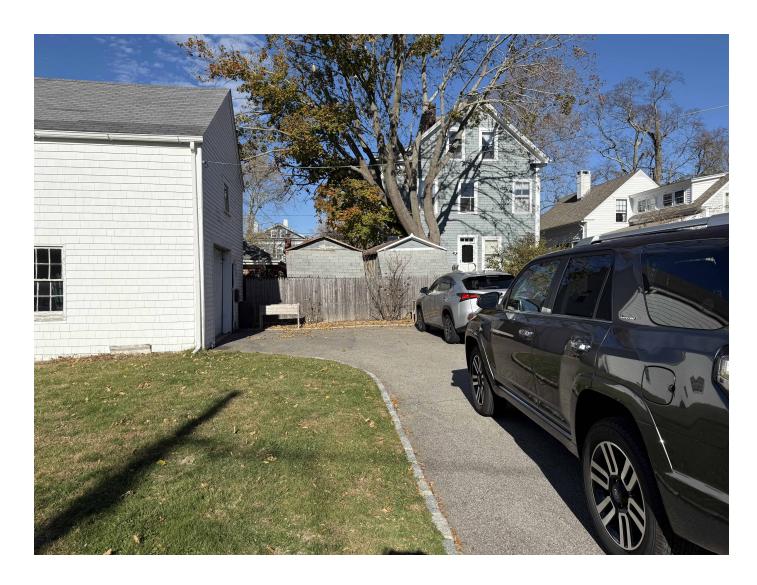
View of north side of property, with existing carriage house & abutting neighbor's sheds
